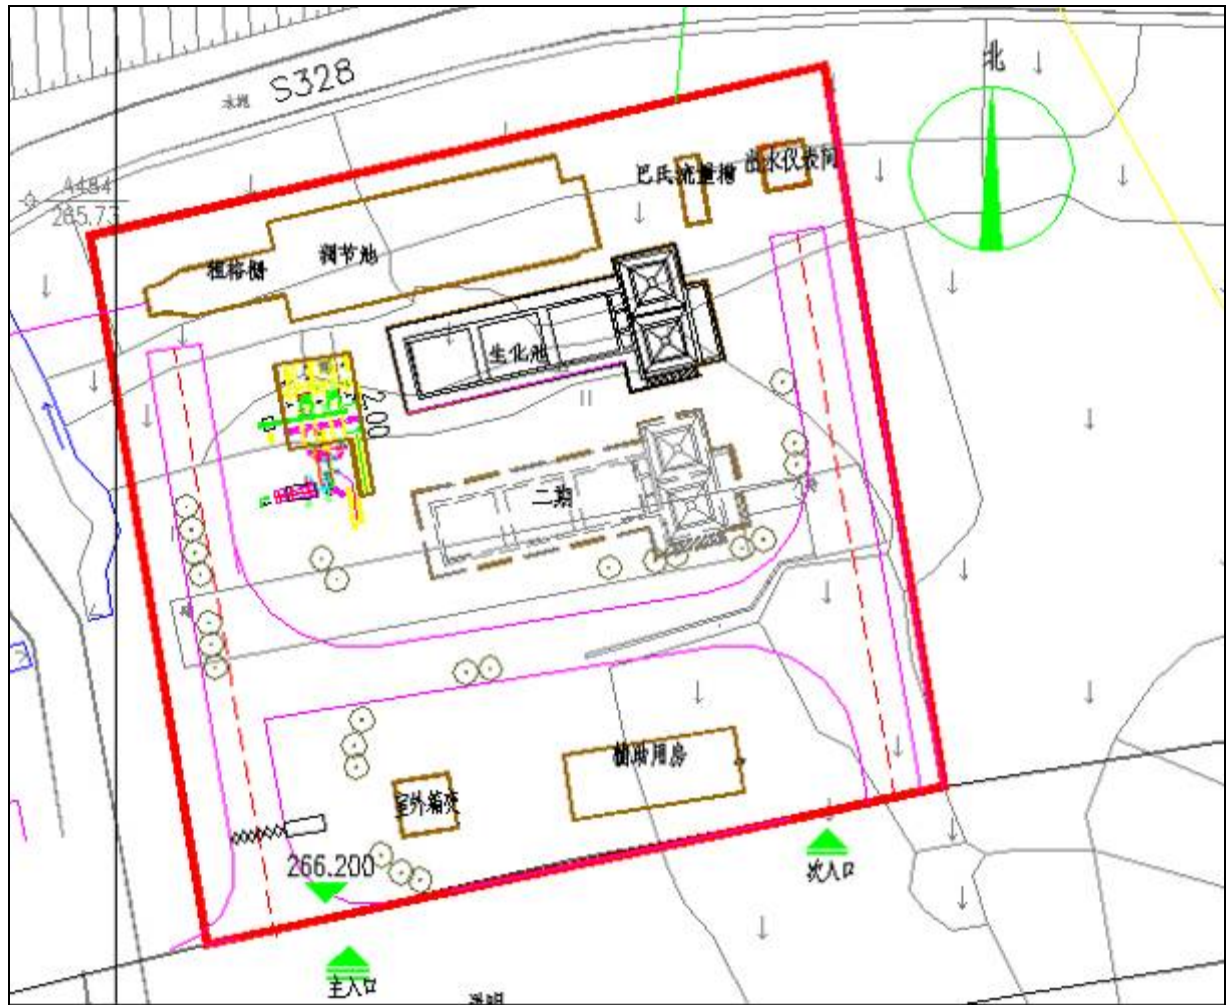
Layout Plan of Sewage Station of Badu Town, Longquan City
